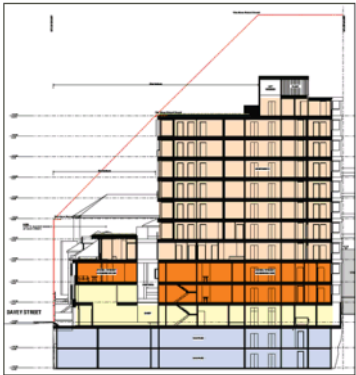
Section drawing illustrating the proposal set within the parameters of the building envelope (red line) shown for context (source: JAWO architects)
